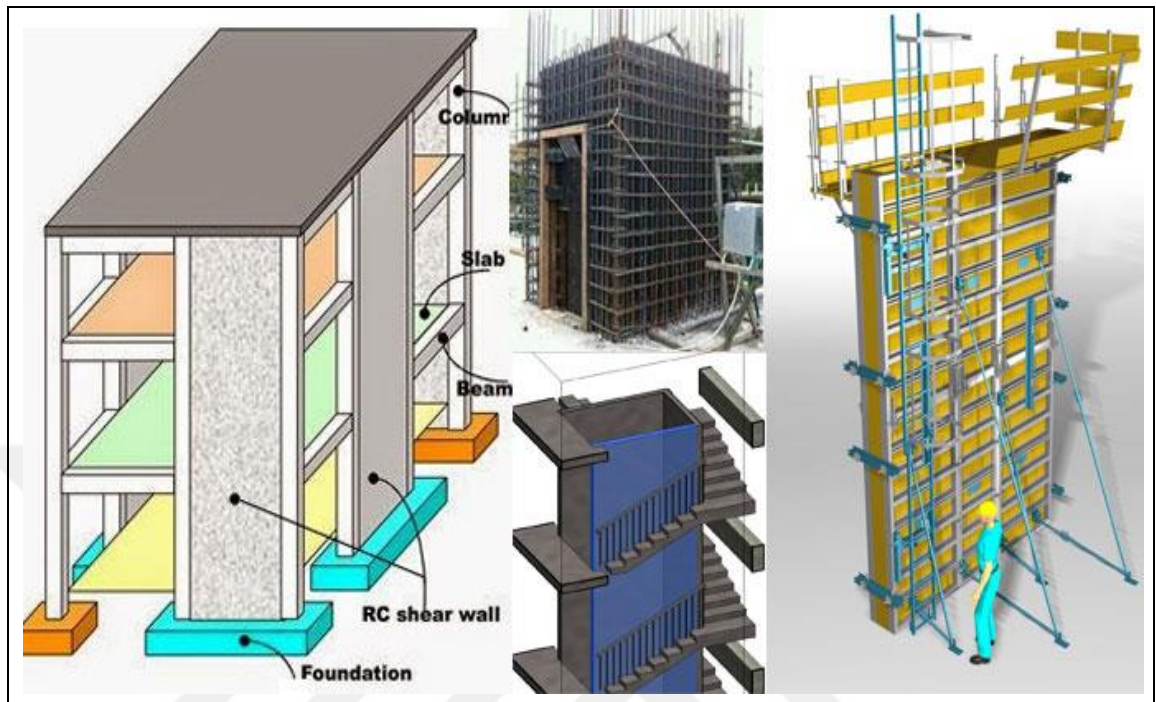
a: Shear Wall Cast in the Construction Site (<https://www.quantity-takeoff.com/load-transfer-system-in-shear-walls.htm>)
